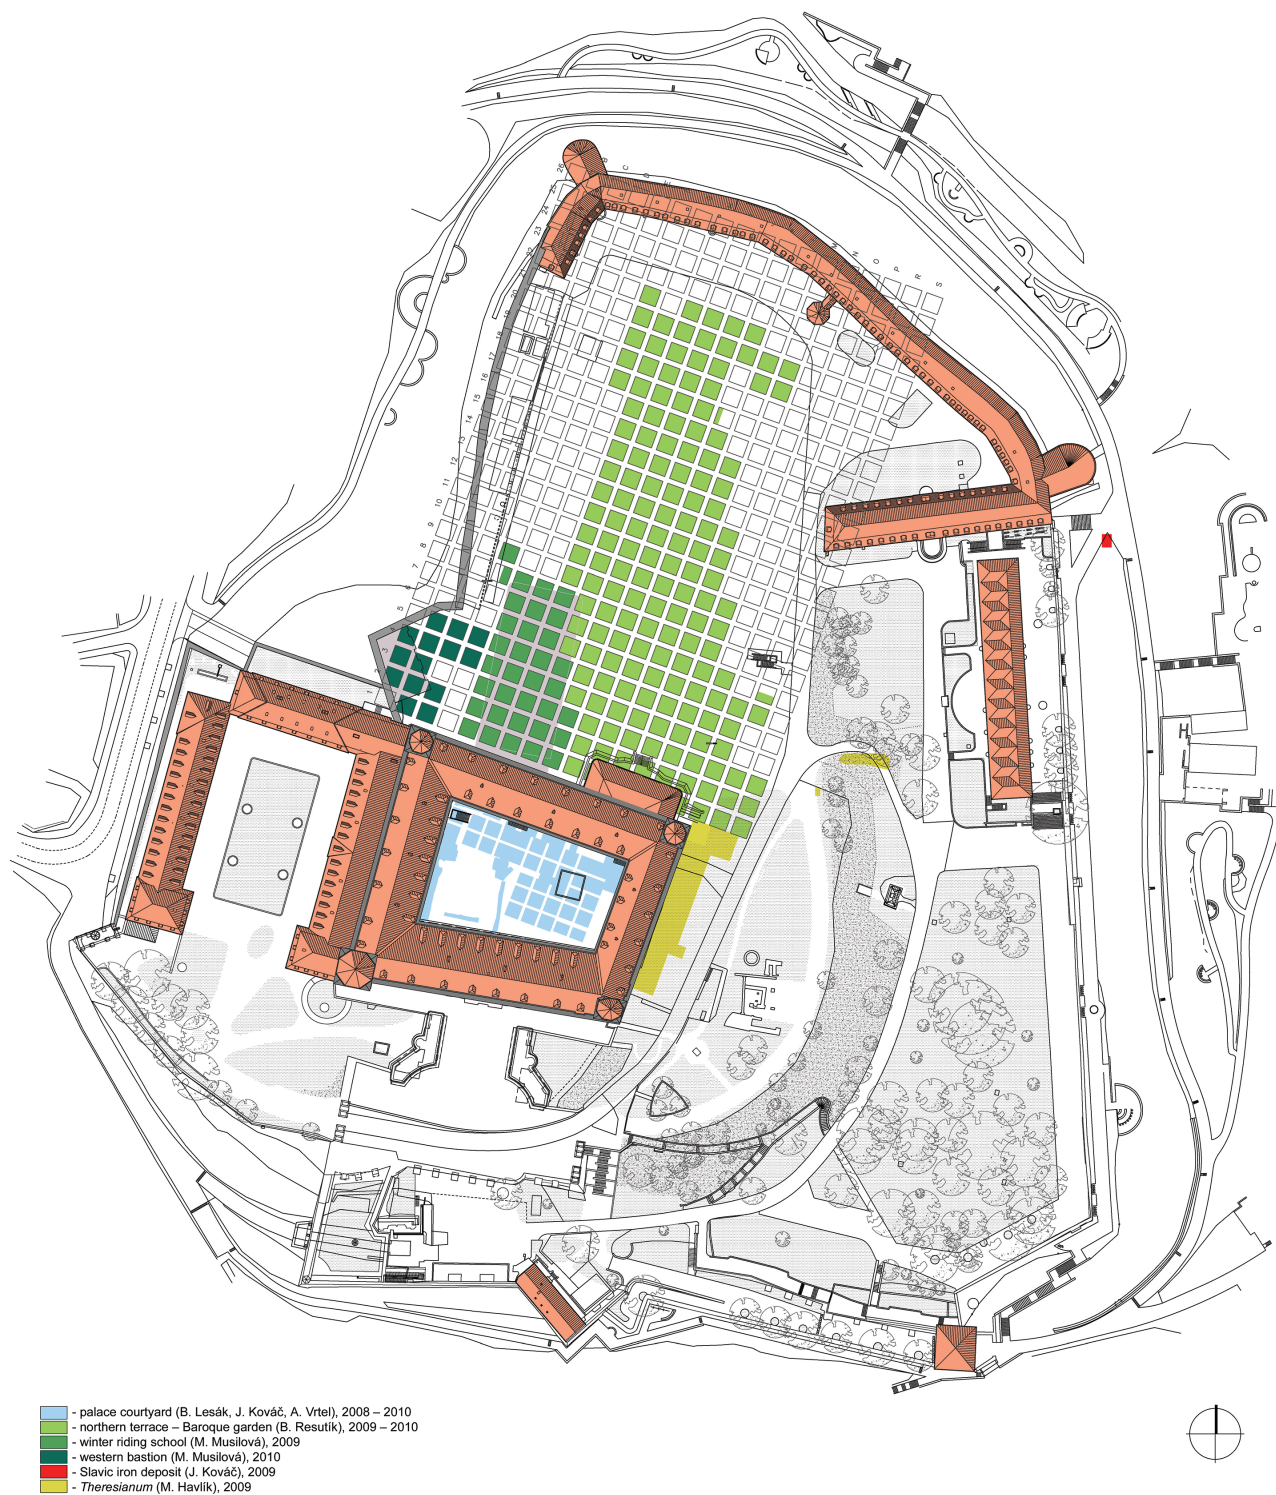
Plan of Bratislava Castle and of the excavations of 2008–2010 (Drawing: B. Gabura, M. Šabík and H. Ondrušková).
